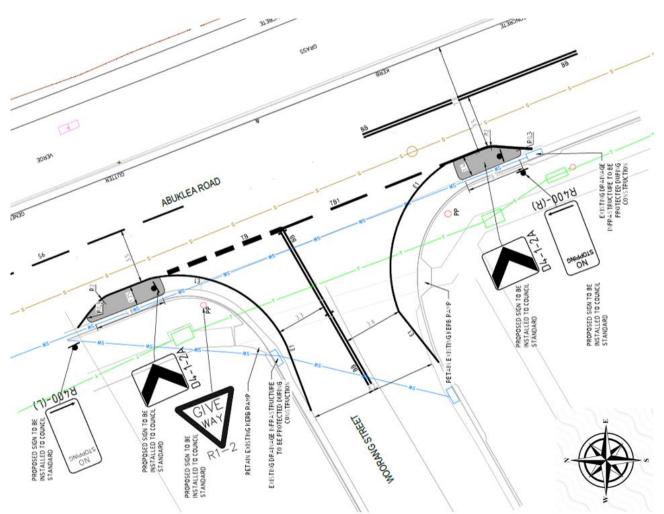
Concept design of intersection treatment Abuklea Road and Woorang Street, Marsfield.
